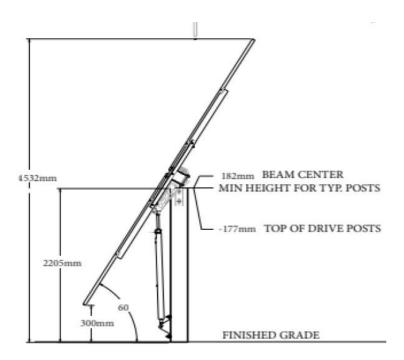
North-south elevation of solar array at maximum tilt. (Source: FNSF, 2022).
